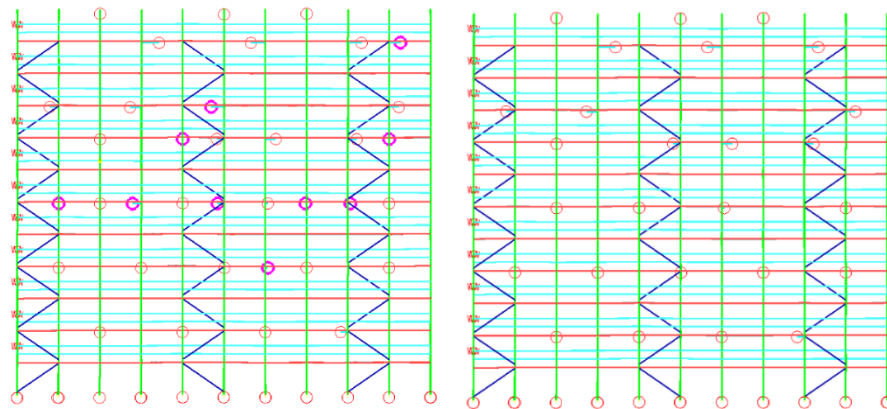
Uniform modification of the anchor system: original anchor layout with marking of the eliminated anchor points (left) and elimination of 10 anchor points on the entire scaffolding (right)
